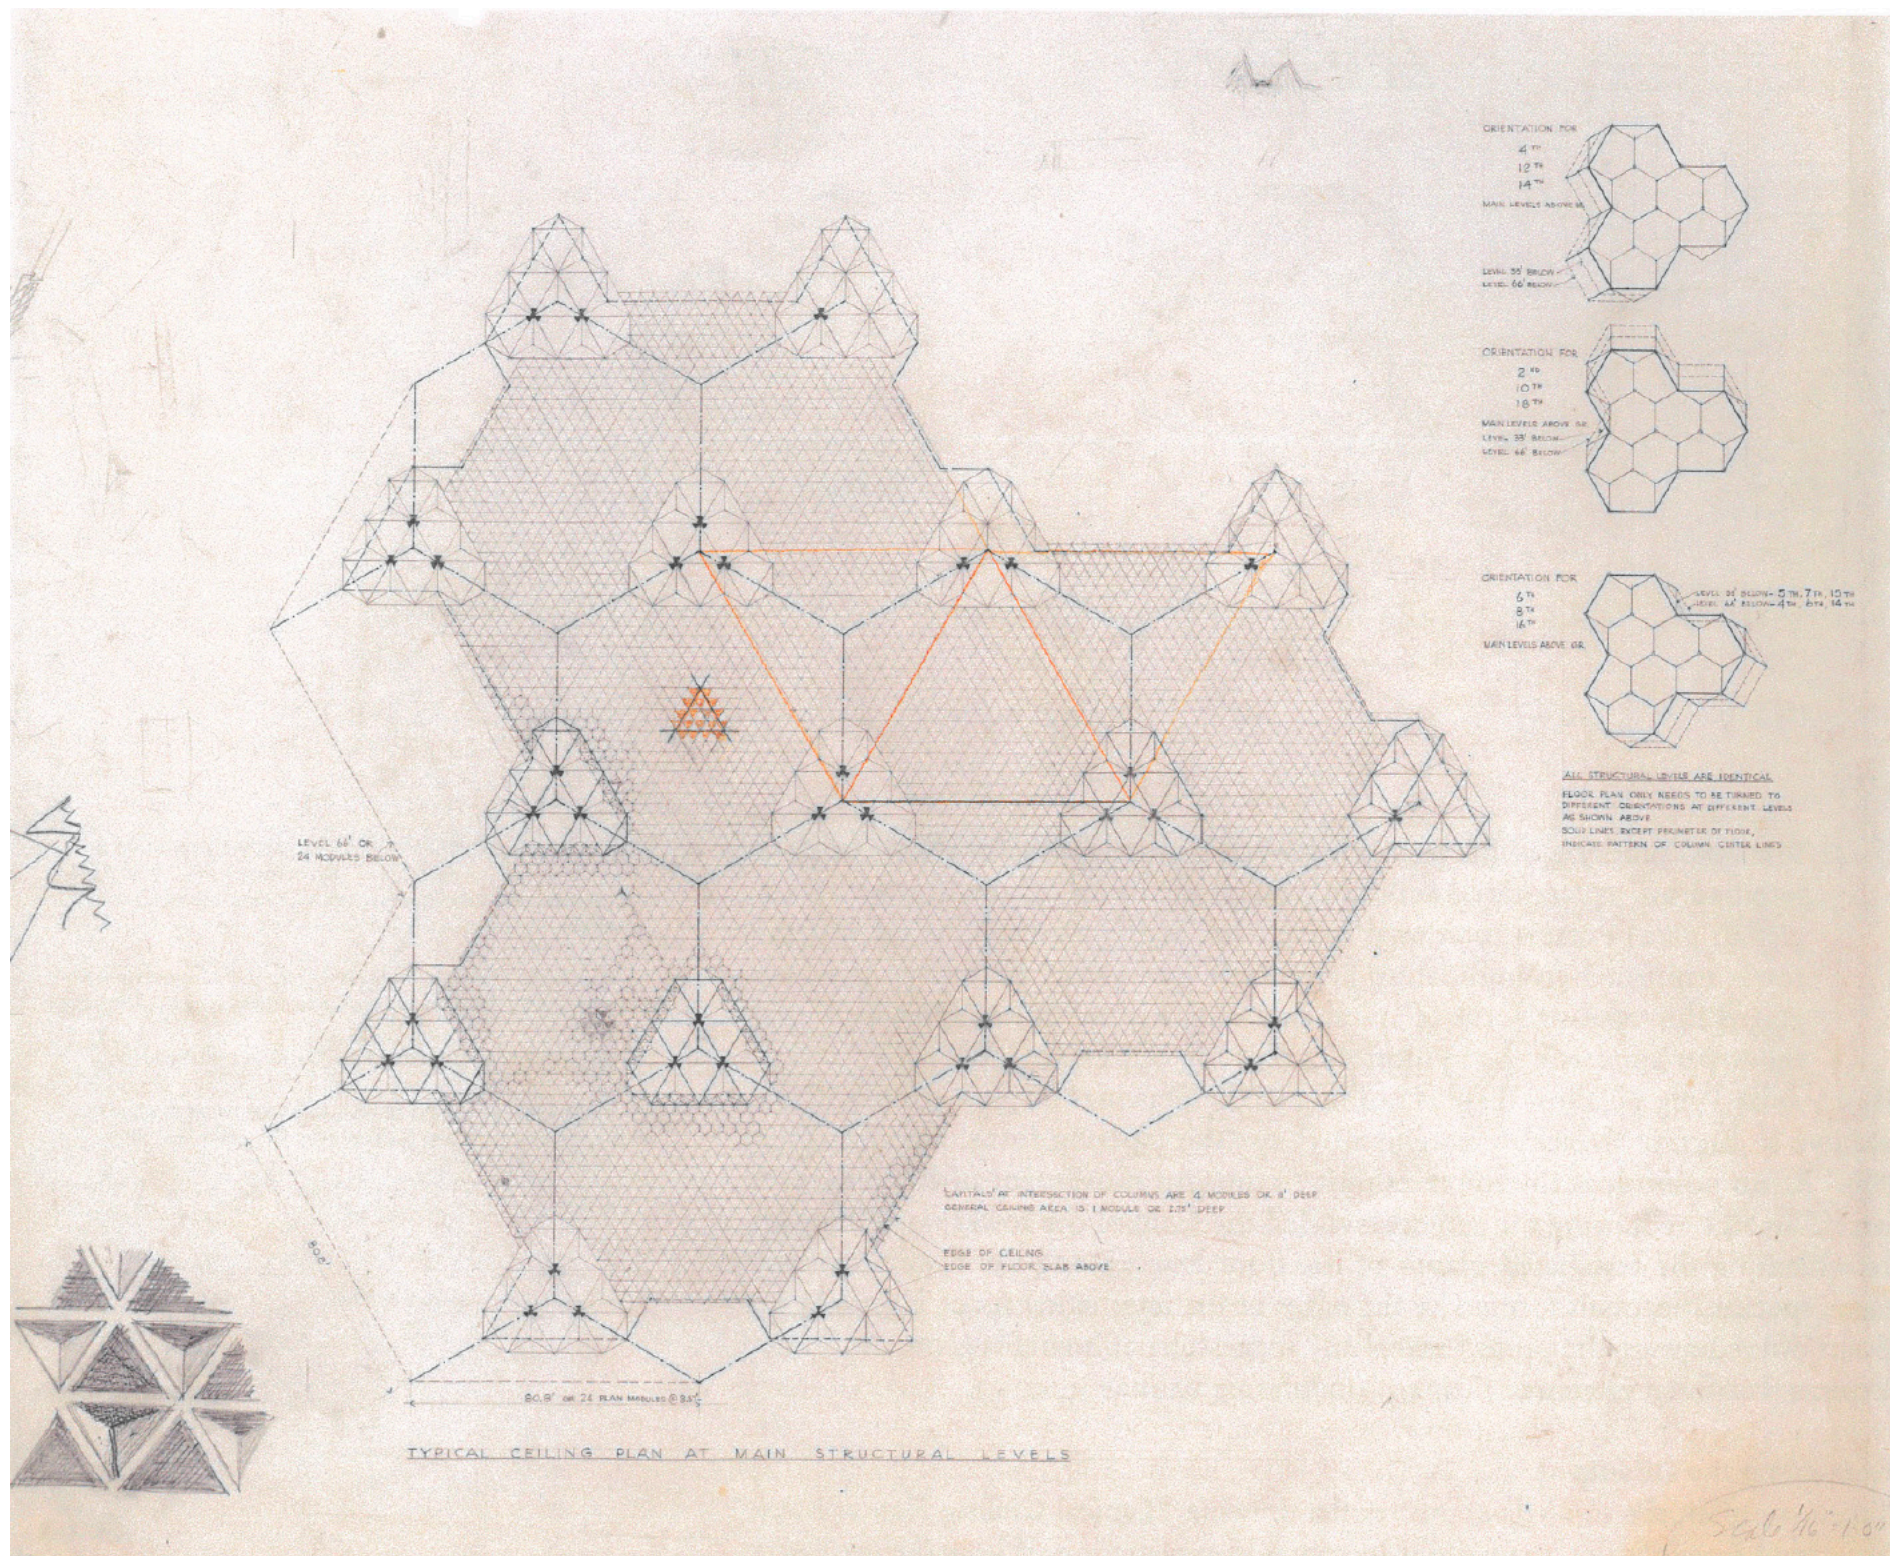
Typical ceiling plan at main structural levels with diagrams showing module types with the directions of the offsets and a sketch of the tetrahedral ceiling, City Tower, ca. 1956-57 (Wesley, 2021, p. 457)
